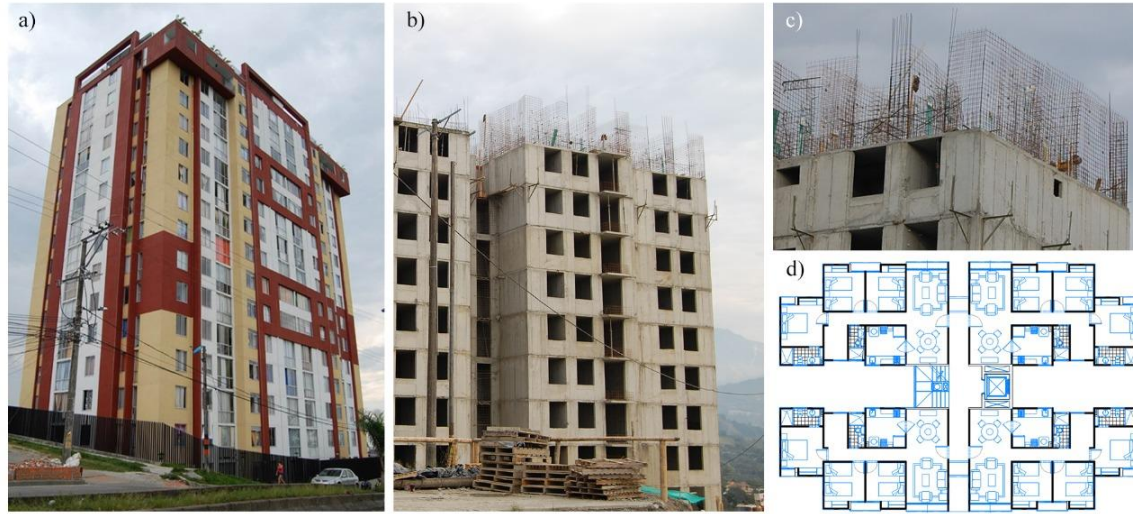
(a) Typical thin RC wall building, (b) construction process, (c) steel reinforcement in form of WWM and (d) typical architectural plan (courtesy of J. Sánchez and C. Arteta).
